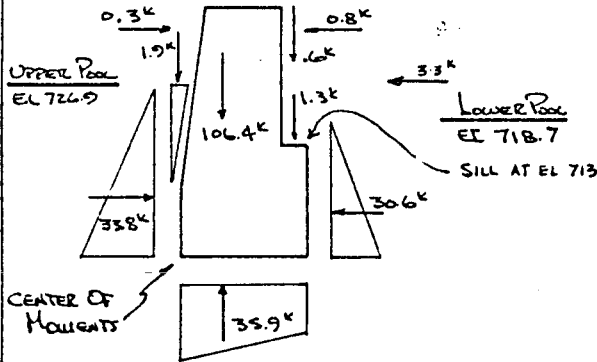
RIVER WALL - UPPER GATE MONO. R-12
